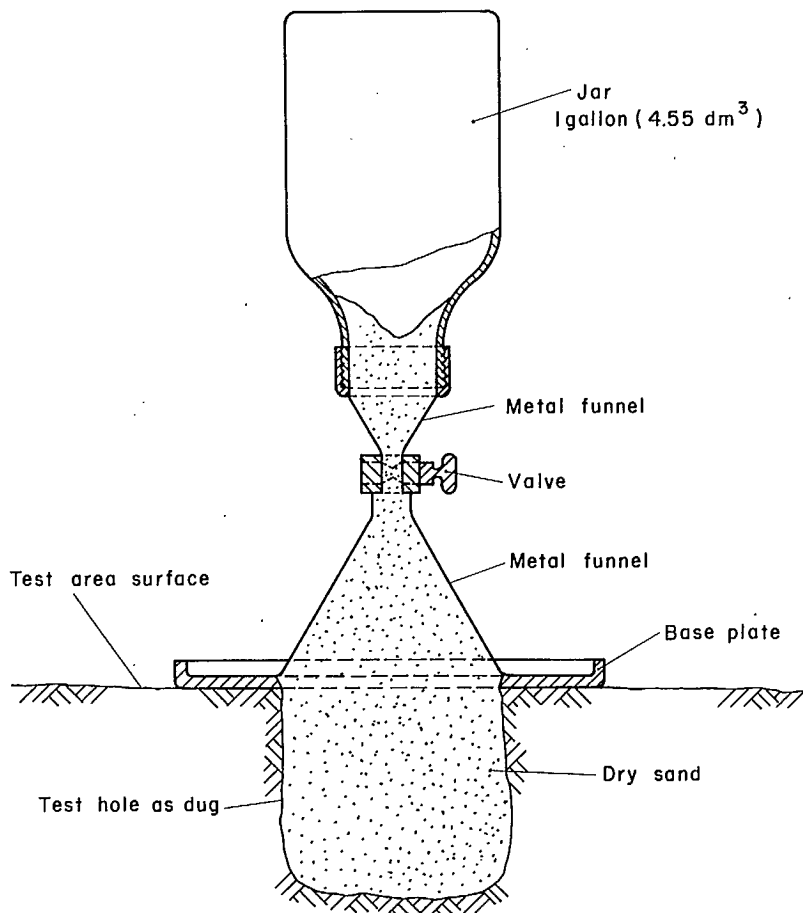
Schematic drawing of the apparatus, indicating the principle of the sand-cone method.
